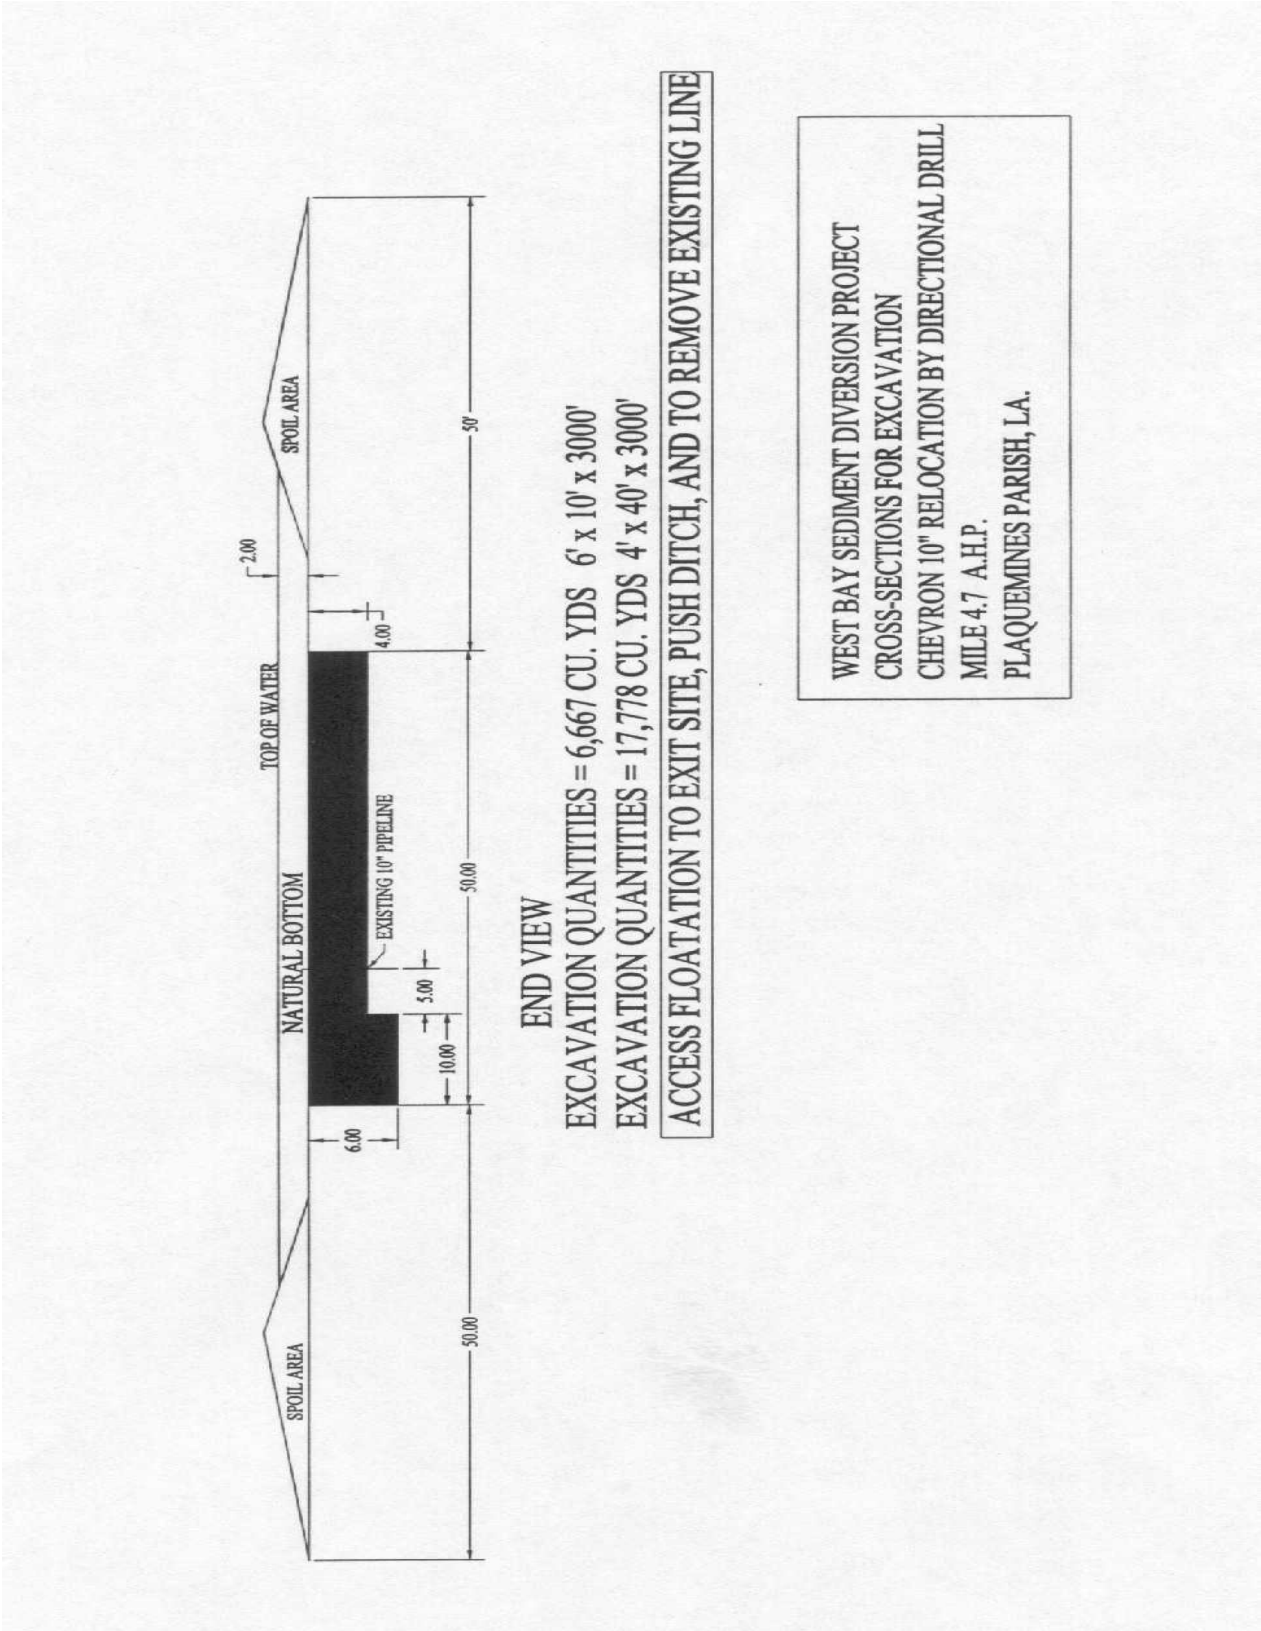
Pipeline Relocation Plans – Tie-in Work Areas.
